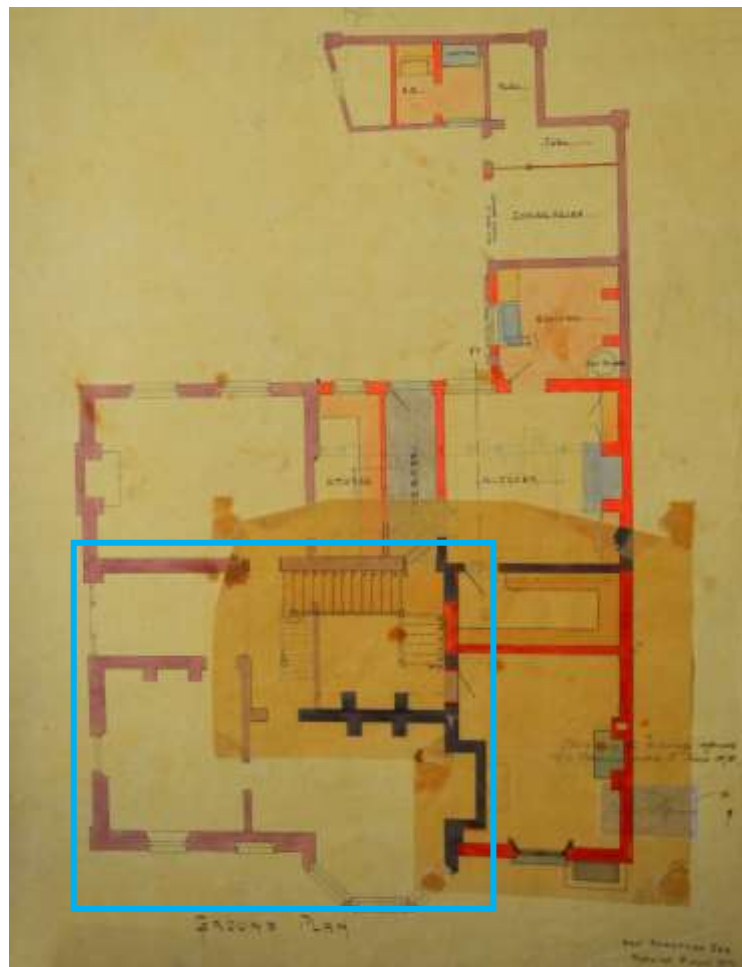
Reeve's house - side entrance plan, first floor, 1881
